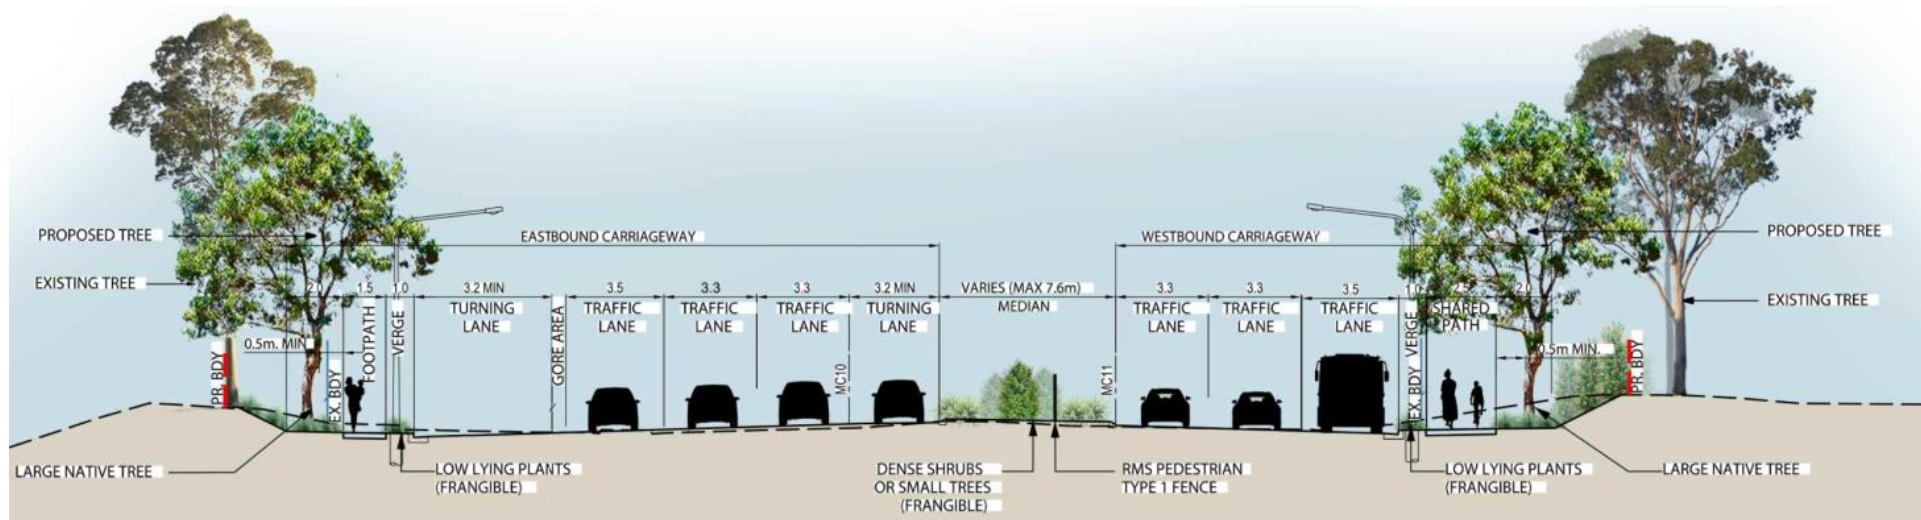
Cross section for Norwest Boulevard (west of the intersection)
